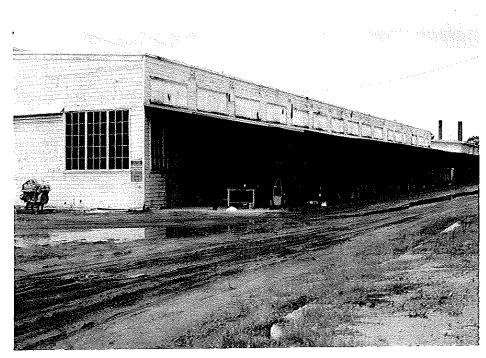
PHOTO NORTHWESTWARD, PAINT BOOTH WAS LOCATED IN NORTHERN CORNER OF BUILDING
